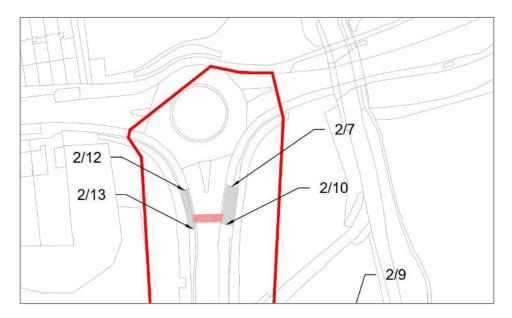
Extract of Rights of Way and Access Plans Sheet 3
